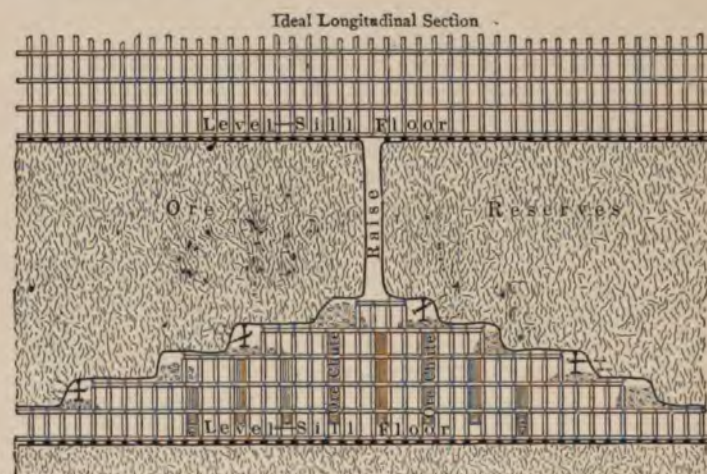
WORKING FLOORS AT ROSSLAND, B.C.
